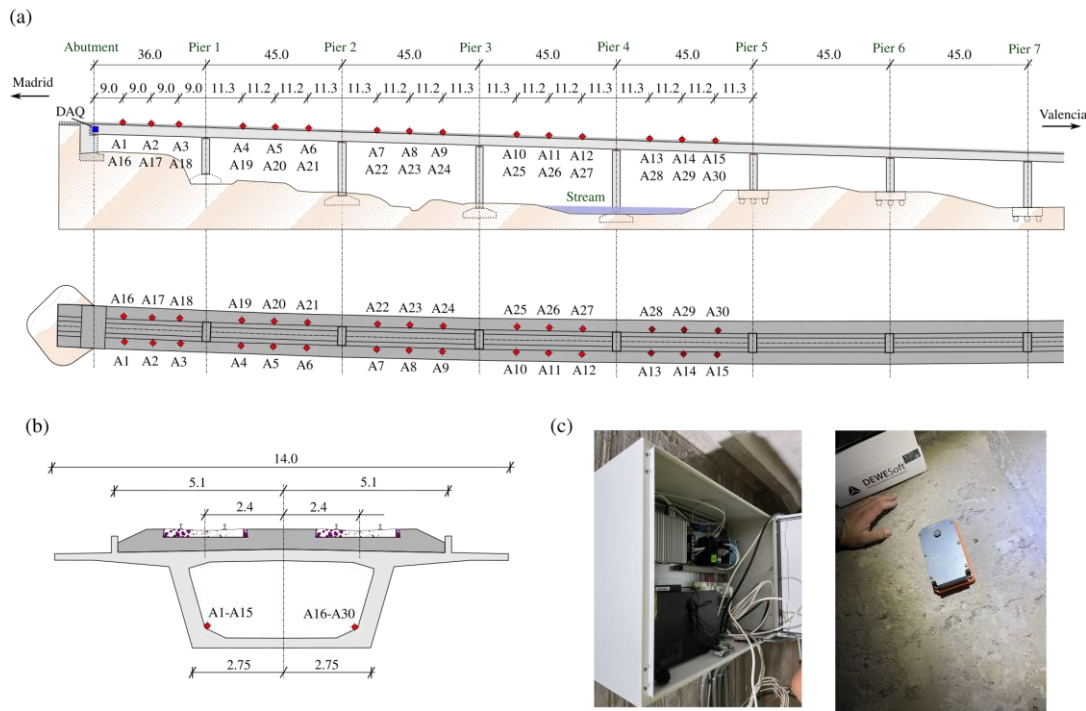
(a) Plan and elevation views of the Huerta de Mateo Bridge with sensor layout; (b) cross-section typology; (c) acquisition system (DAQ) and triaxial accelerometer positions. Dimensions in meters.
